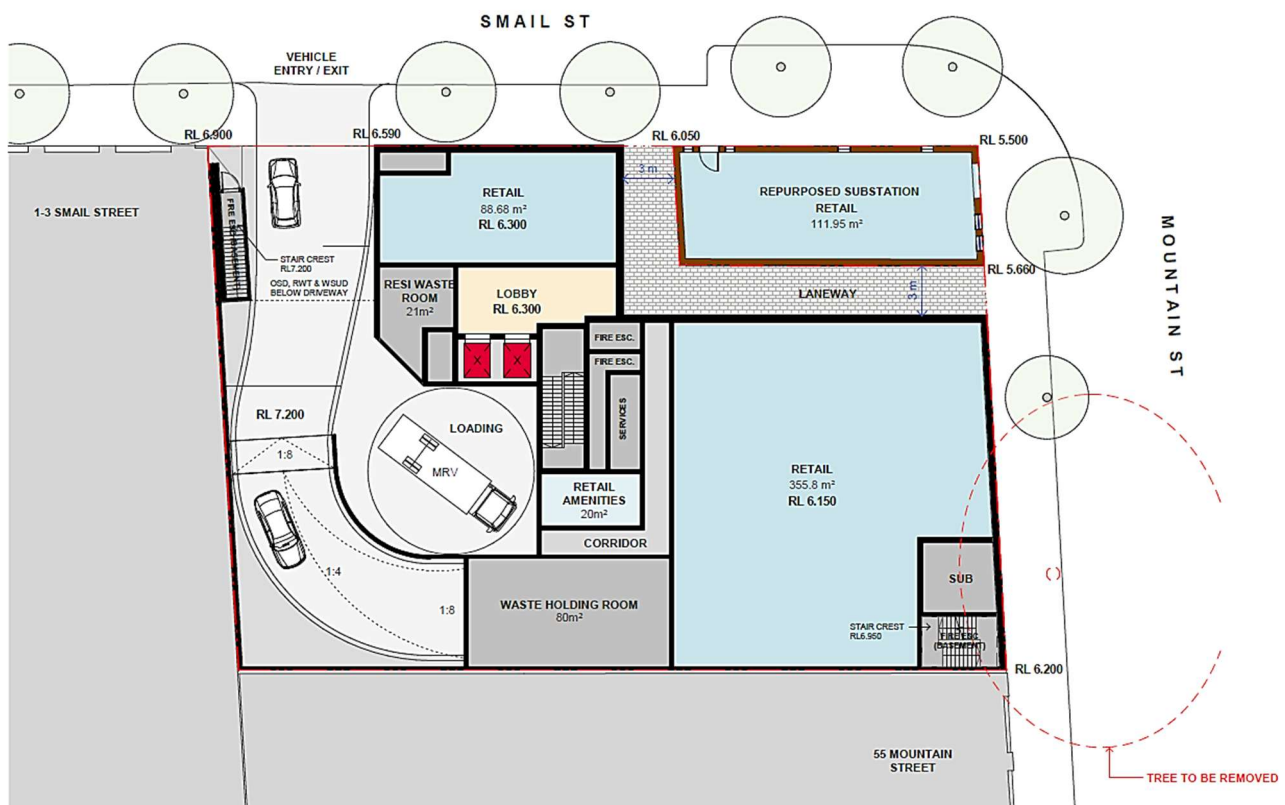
Proposed planning proposal Ground Floor Plan (PP03.00).
